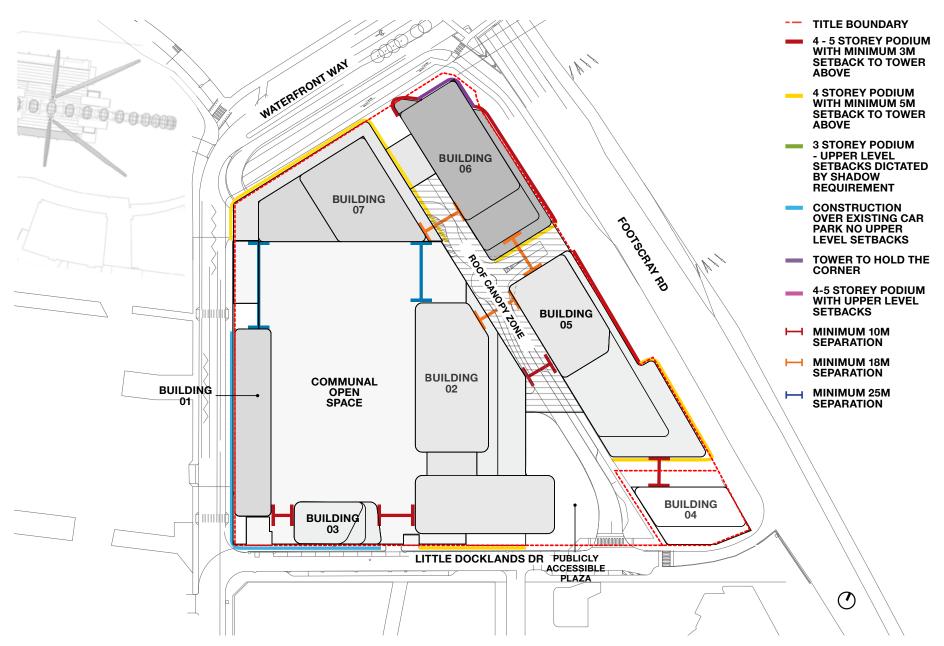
Concept Plan 6 - Podium Heights, Tower Setbacks and Tower Separation - Roof Plan
